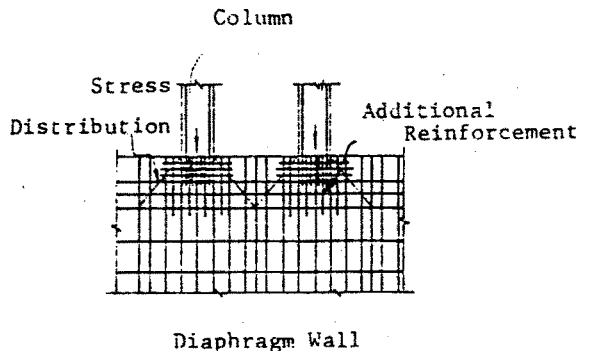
Additional Reinforcement for Transfer of Vertical Load
